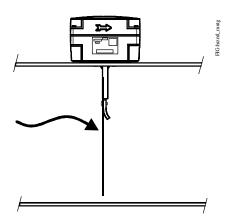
Mounting the F262 Switch in a Horizontal Duct
